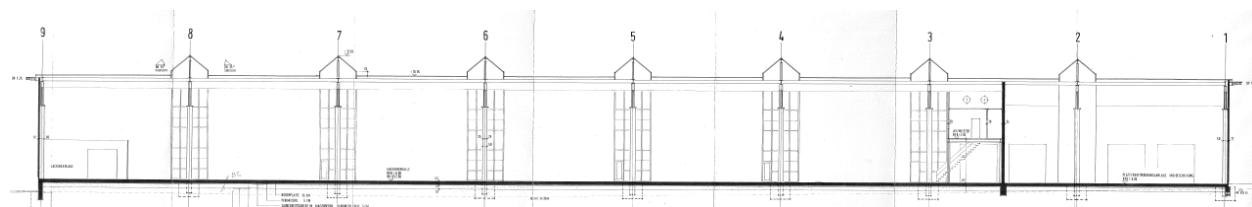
Section E-E of the hall by Schöne + Seeburger
